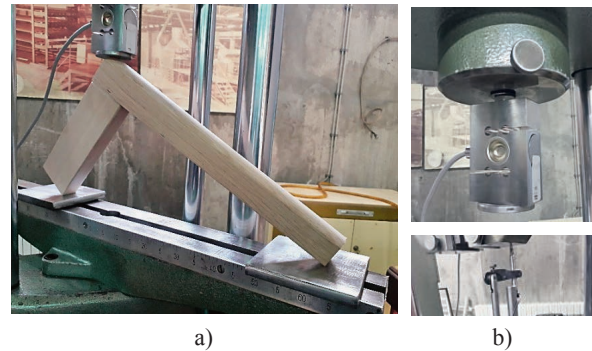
Joint testing: a) set-up of joints in testing machine, b) load cell and inductive displacement transducer
